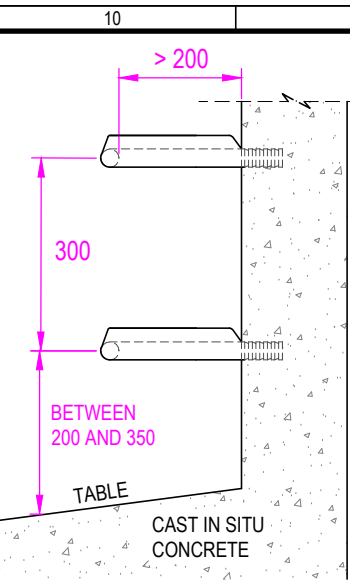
E (SECTION VIEW). STEP IRON INSTALLATION
